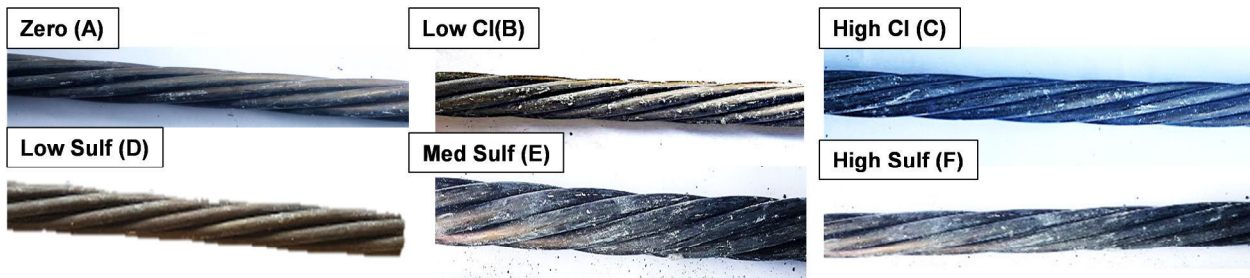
Photos of embedded strands in MIT samples (Lower Elevation).
